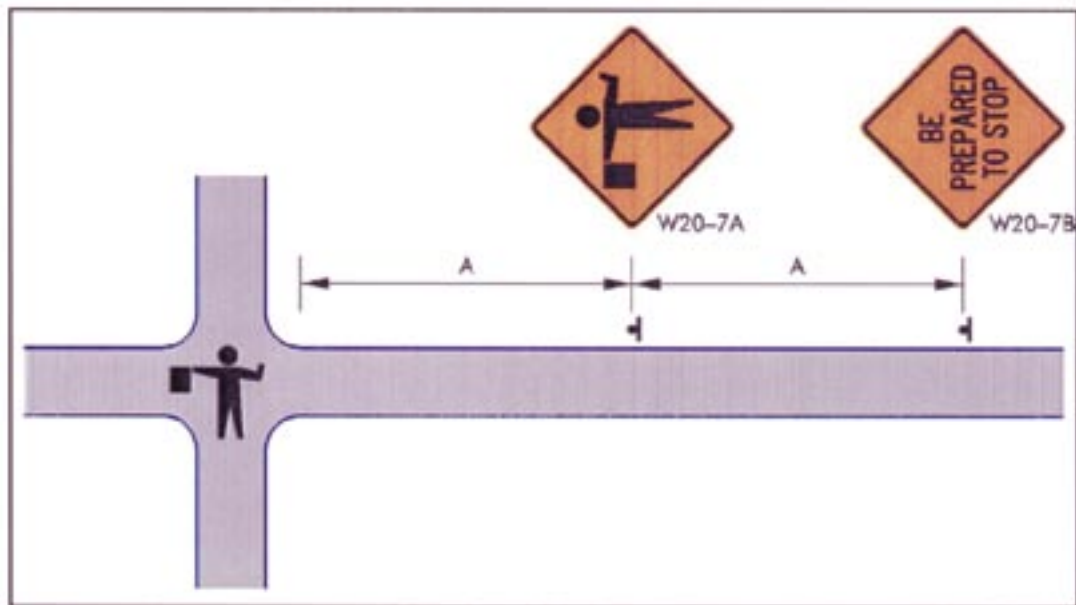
Standard signing plan for flagger-controlled intersection.
